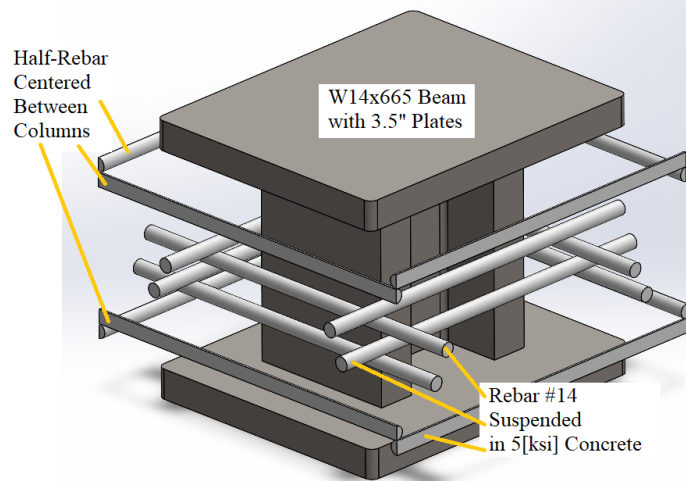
Typical FEA Foundation Segment, w/o Concrete
